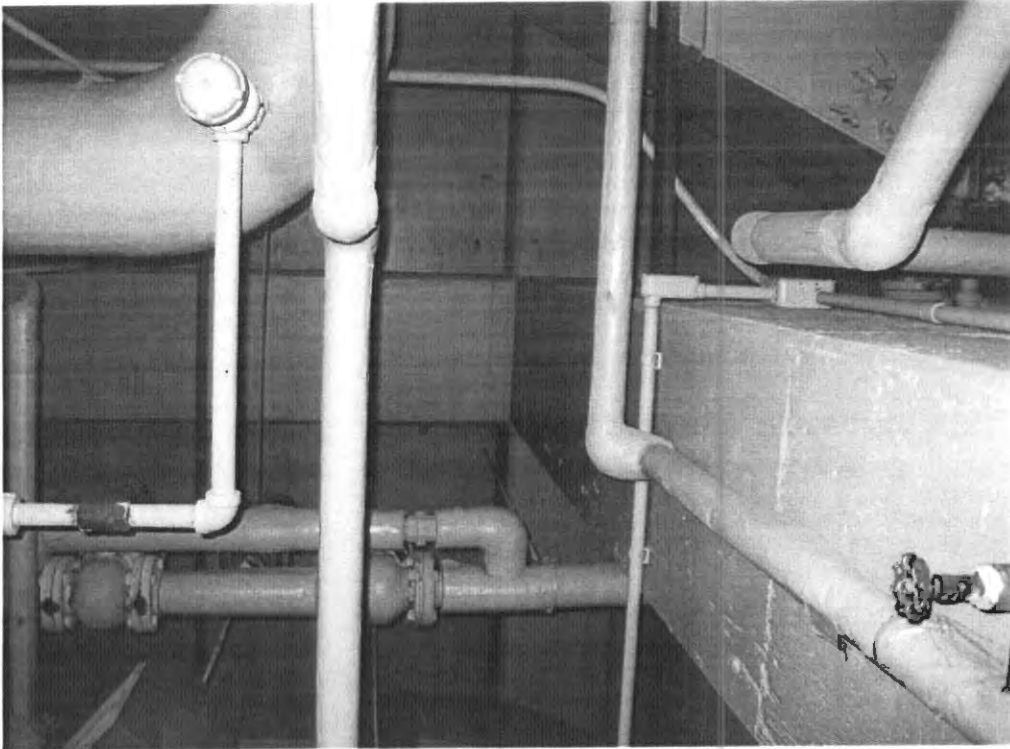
Sample photo of the existing structure (reinforced concrete beams and columns.)
